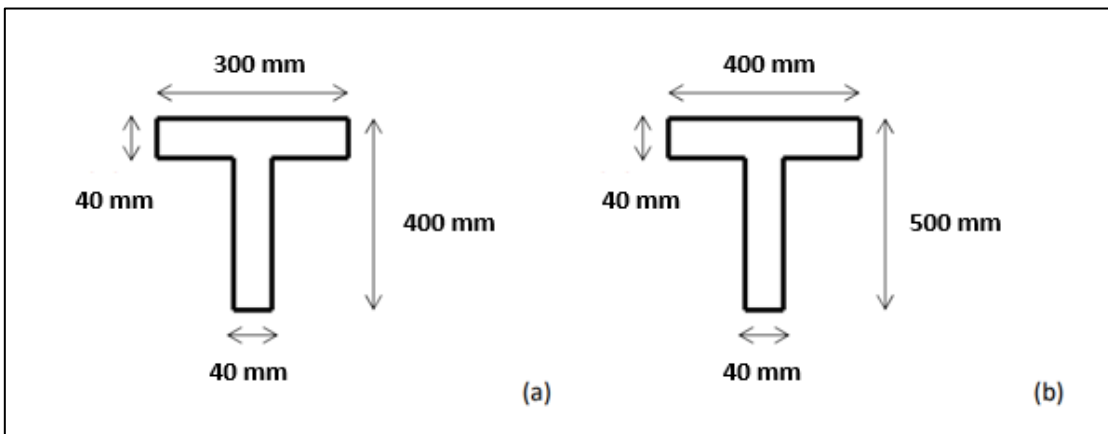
Cross section dimensions of ring stiffeners (a) and longitudinal stiffeners (b) [12]
